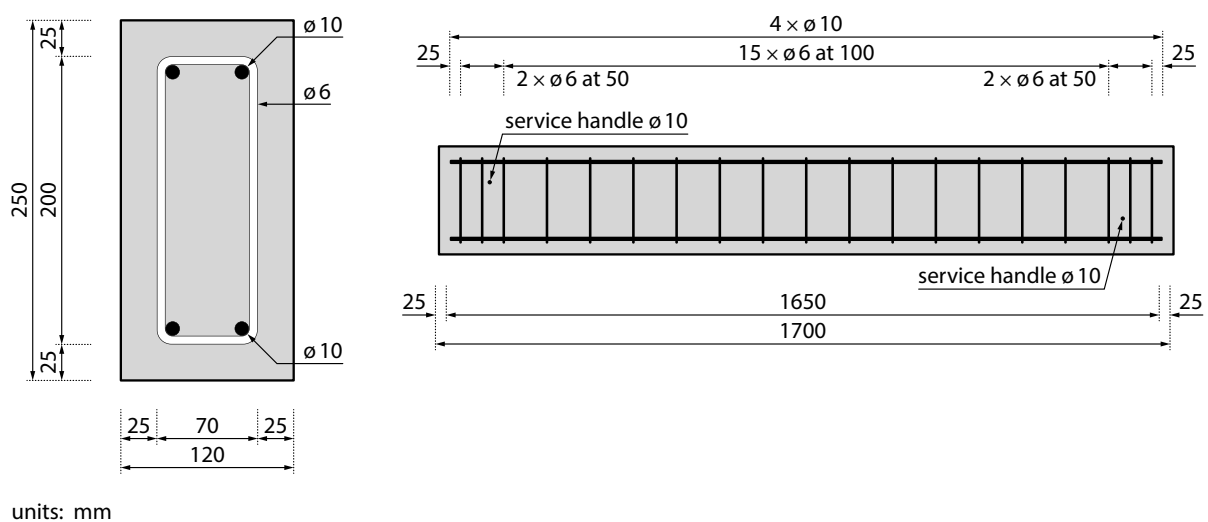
Reinforcement of the concrete beam used in the HVI experiment.
